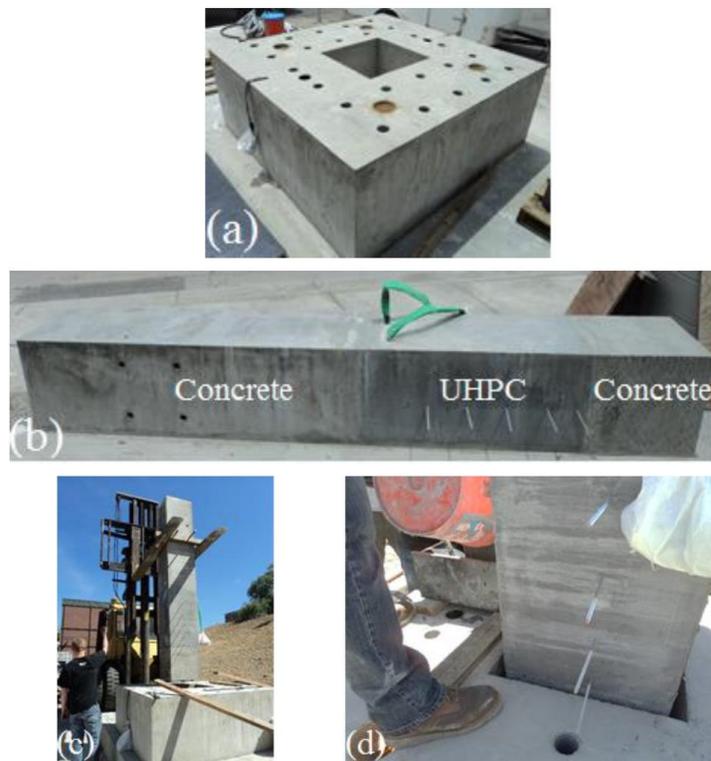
60 (a) precast footing with central pocket; (b) precast column with UHPC in the plastic hinge; (c) inserting column into the pocket; (d) filling the gap by UHPC [69].
